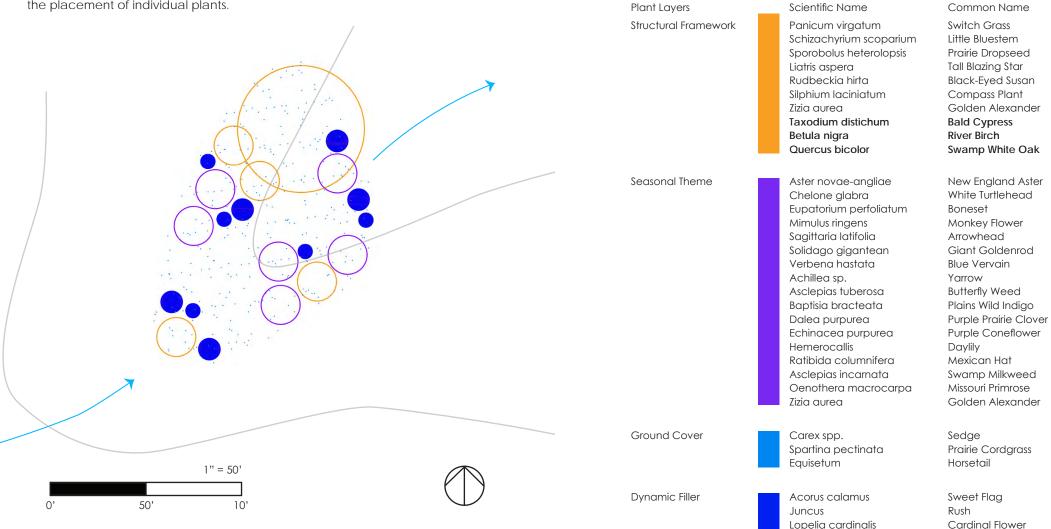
North Jardine Bioretention Site E Planting Plan and Palette.
